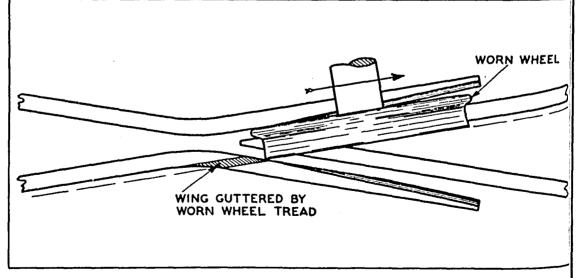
GUTTERING OF WING RAIL. WIDE ANGLE CROSSING.
